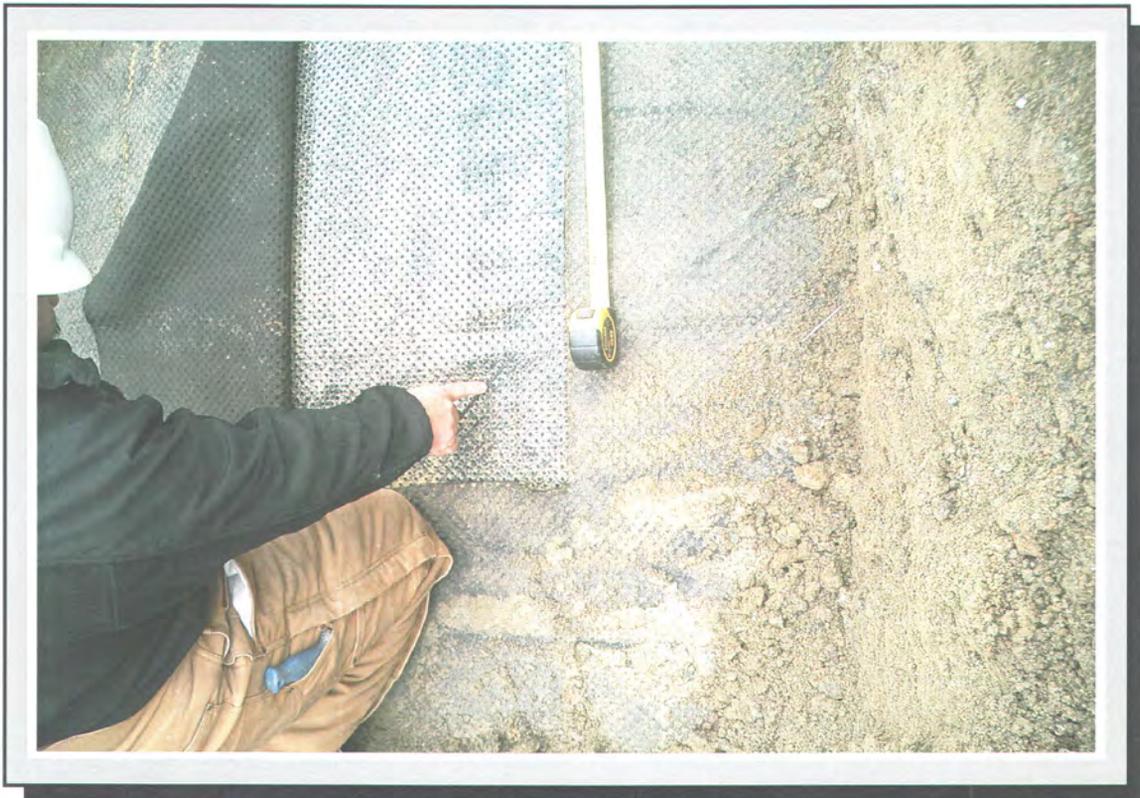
Test Pit 3 - top of non-woven geotextile filter overlying drainage features of geomembrane.
